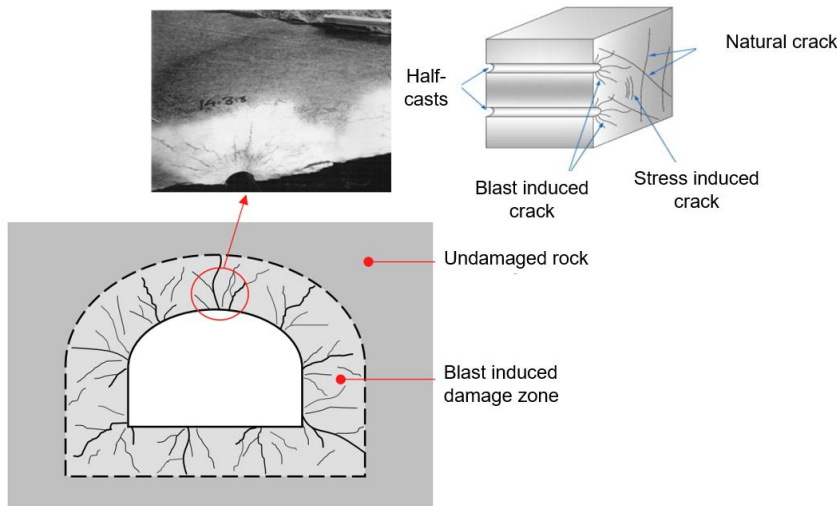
Rock mass condition around a tunnel boundary excavated by drill and blast. The damaged zone comprises of discontinuous fractures of microscopic to macroscopic sizes with complex fracture patterns due to radial cracks. (Olsson et al., 2008)
